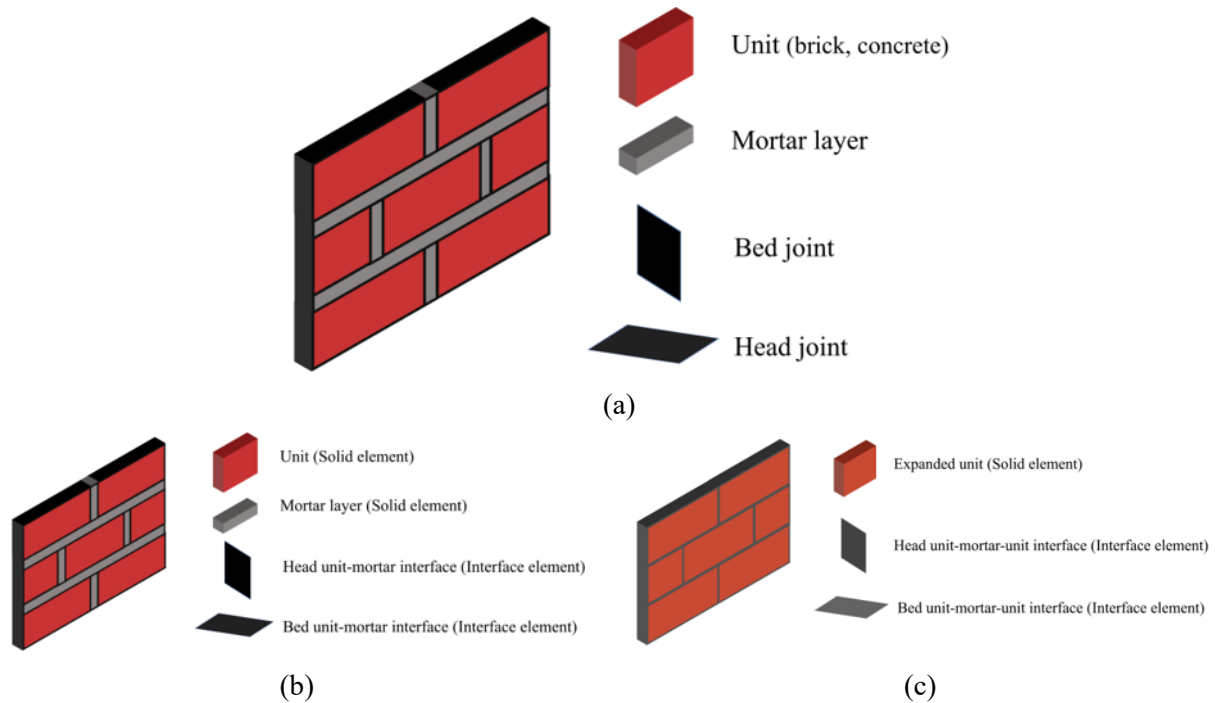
FE micro modeling strategies for masonry structures: (a) masonry specimen, (b) detailed micro modeling approach, and (c) simplified micro modeling approach
